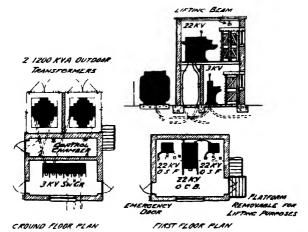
Duplicate industrial sub-station with outdoor transformers, "single-switch" type.
